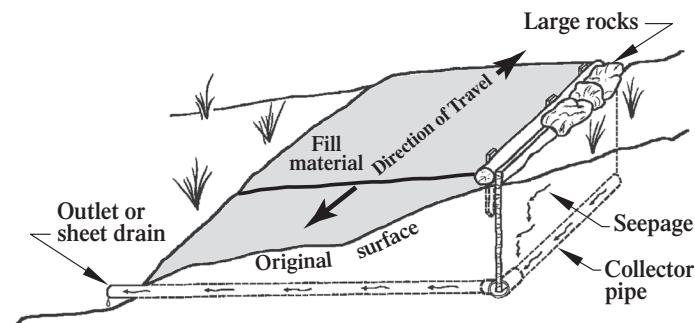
A sheet drain or geonet can be used to intercept seepage.
